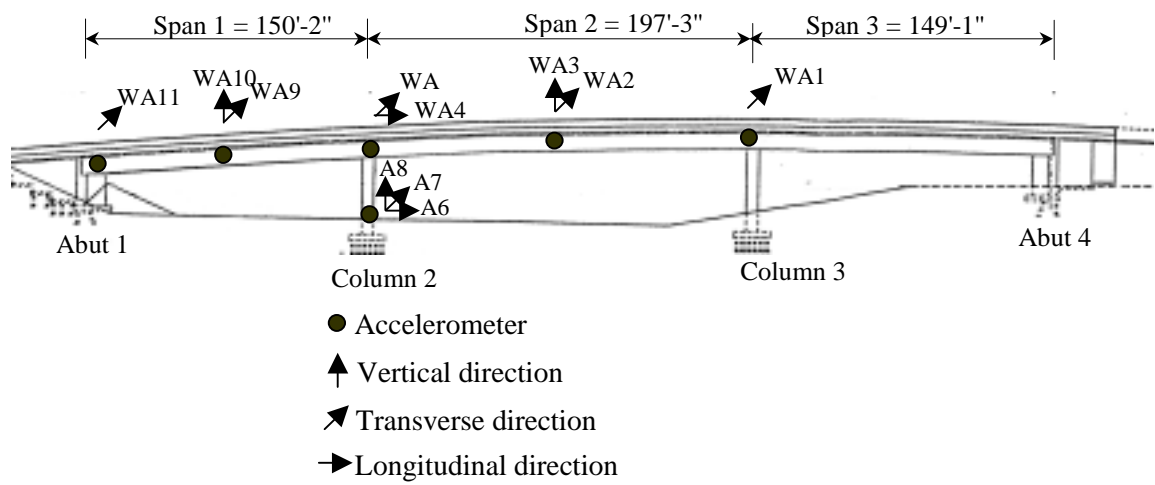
Accelerometer Arrangement at West Street On-Ramp; Elevation
